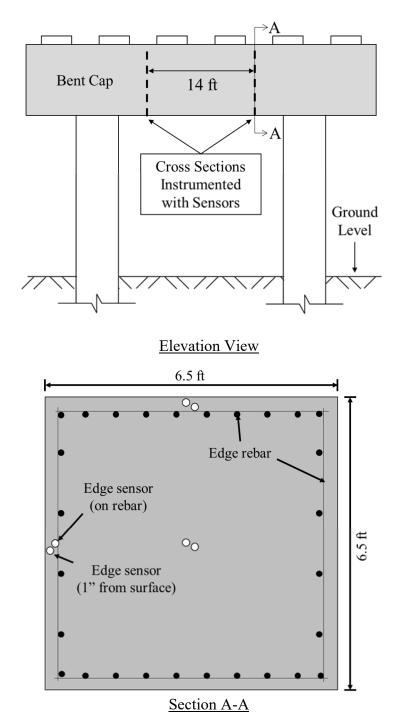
Albertville bent cap instrumented cross section locations (top) and temperature sensor locations on these cross sections (bottom)
